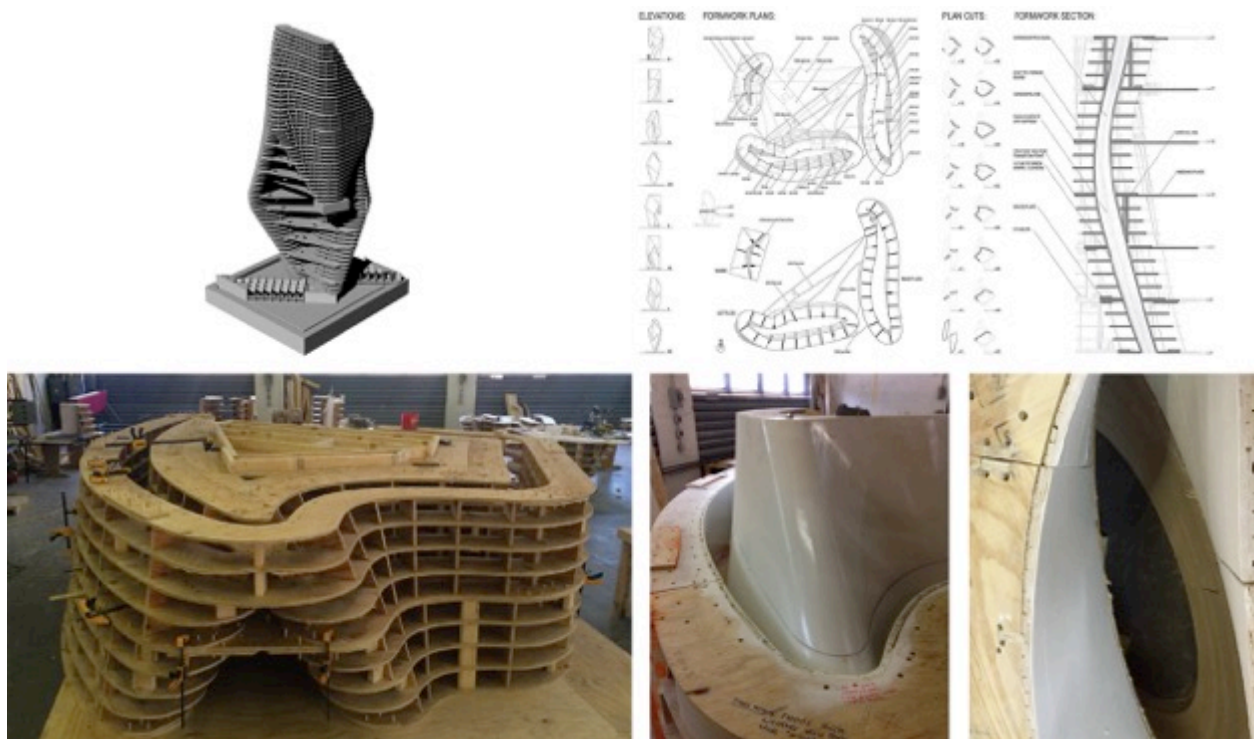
Top Left: 3D model of formwork; Top Right: Formwork Drawings; Bottom Left: Two way CNC cut frame; Bottom Right: Double curvature form being fit together for tolerance check
